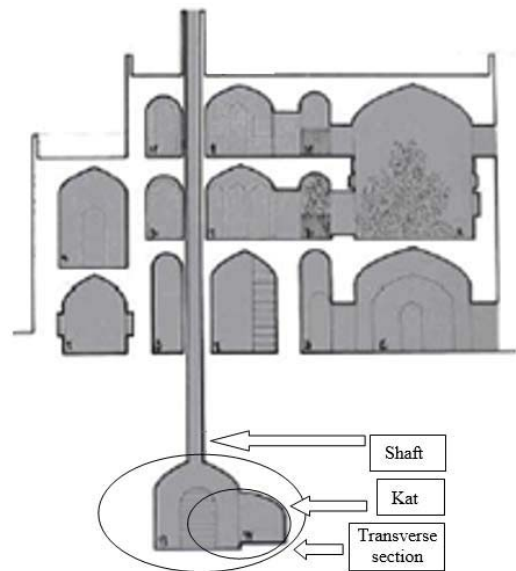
Transverse section of a Shavadoon and ventilation shaft and Kat space
